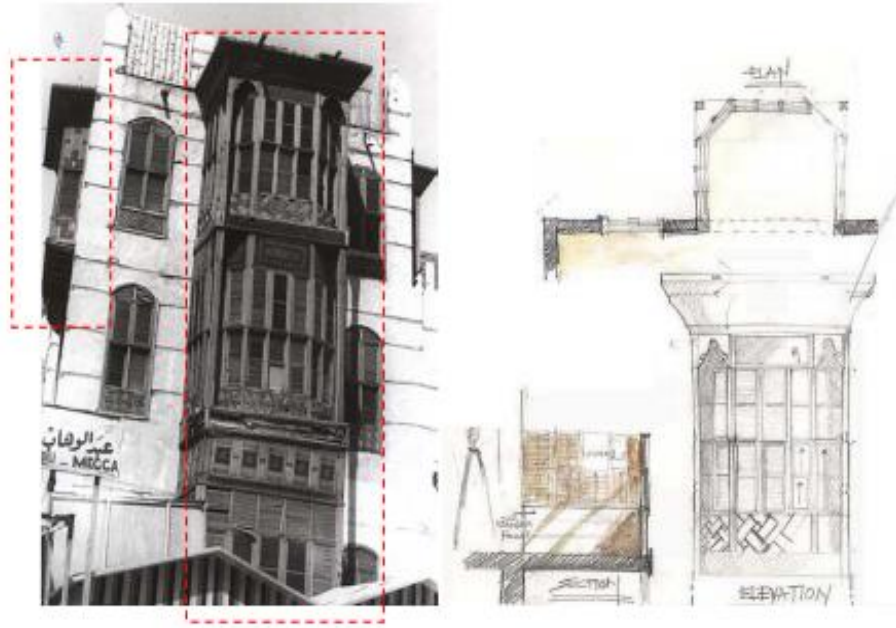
Roshan as a continuous element on the façade (Al Murahhem, 2008)
